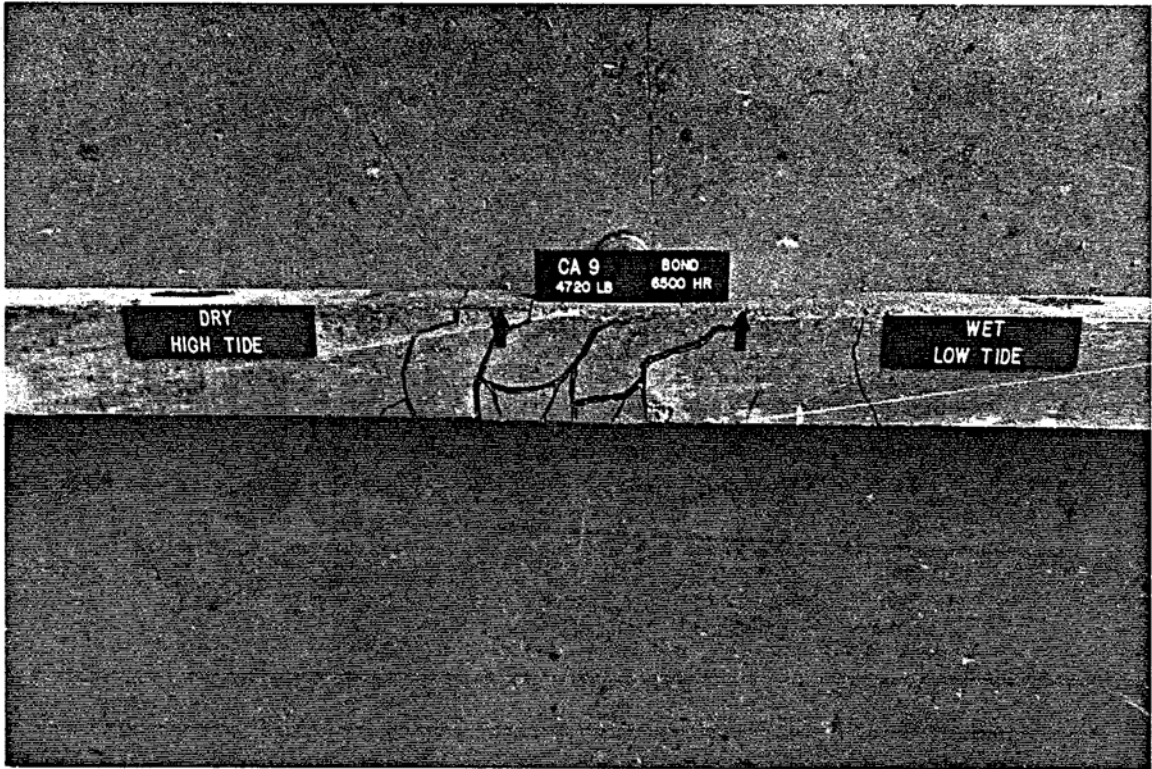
Crack Pattern for Beam CA 9 - Tested After 6,500 Hours
